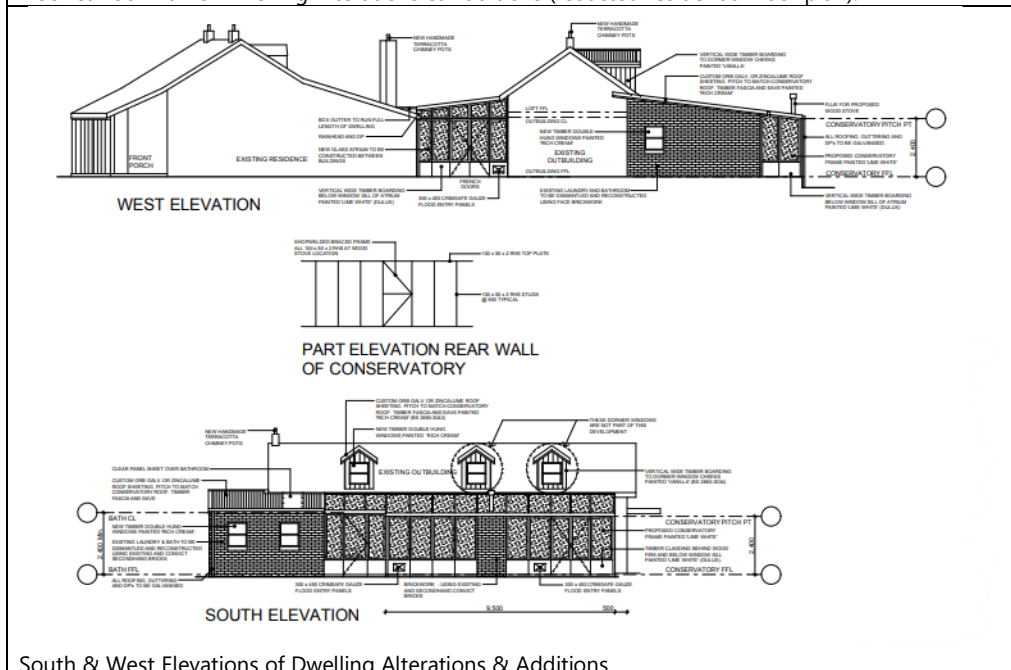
Dwelling alterations and additions (Atrium, Conservatory, Bathroom), Detached Garage, Detached Shed, Detached Bathroom (for Toll House), Deck with Pergola and Inground Swimming Pool
